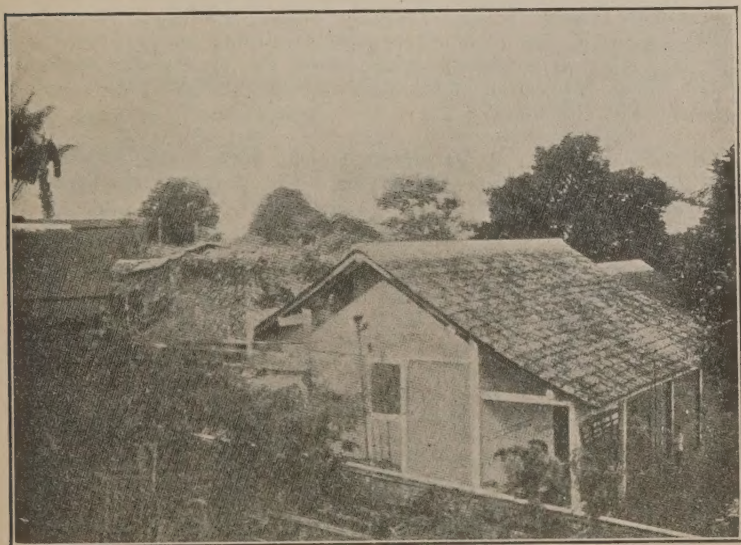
New rat-proof native house at Malang, Java, with ventilation-opening beneath the roof.
